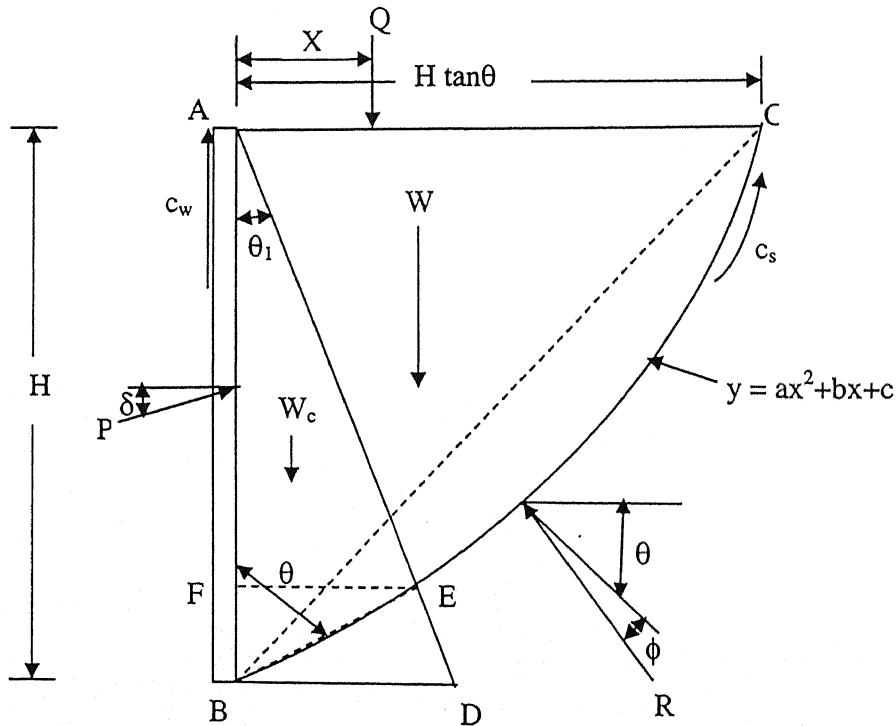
Forces acting on counterfort retaining wall (line load, unreinforced backfill)
